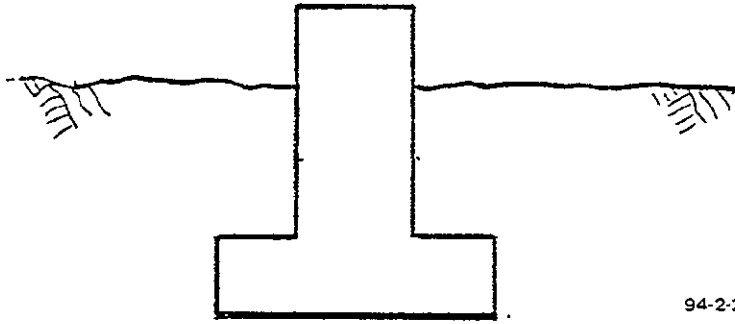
TYPICAL RING GIRDER FOUNDATION CONFIGURATION
